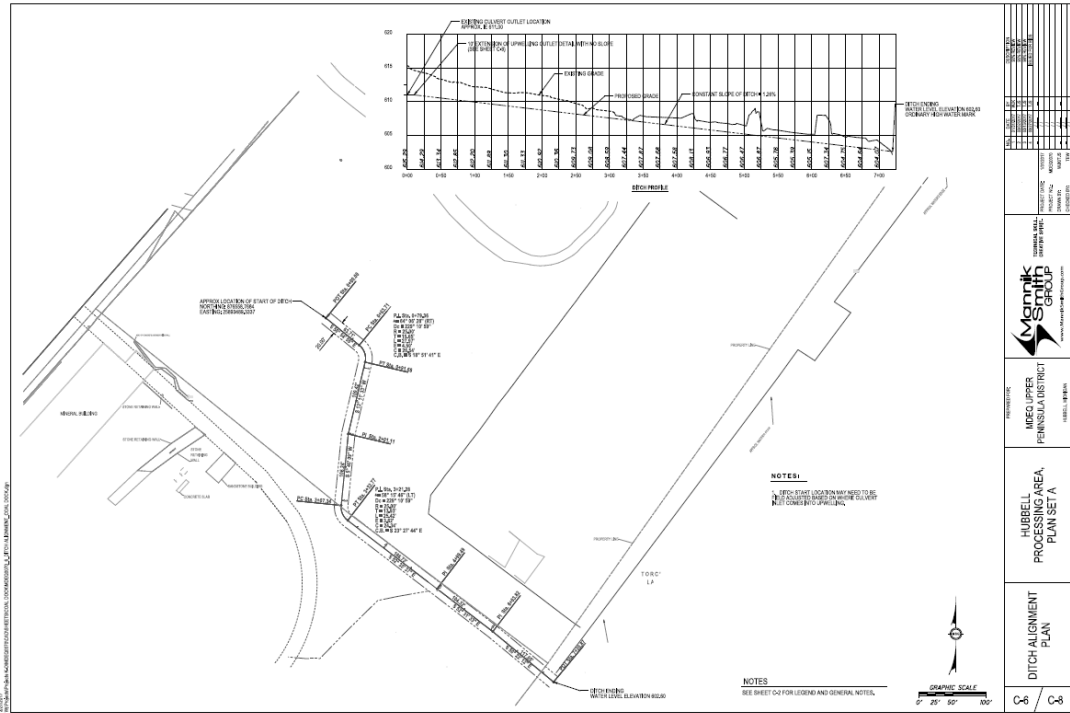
MSG Hubbell Processing Area Drainage Ditch Alignment Plan [18].
